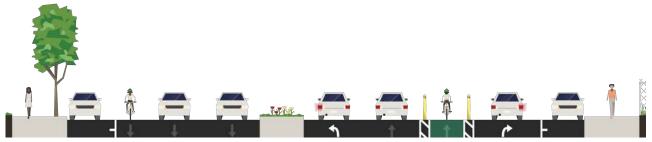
Proposed cross section of Evans Avenue on the east side of 3rd Street, looking west
